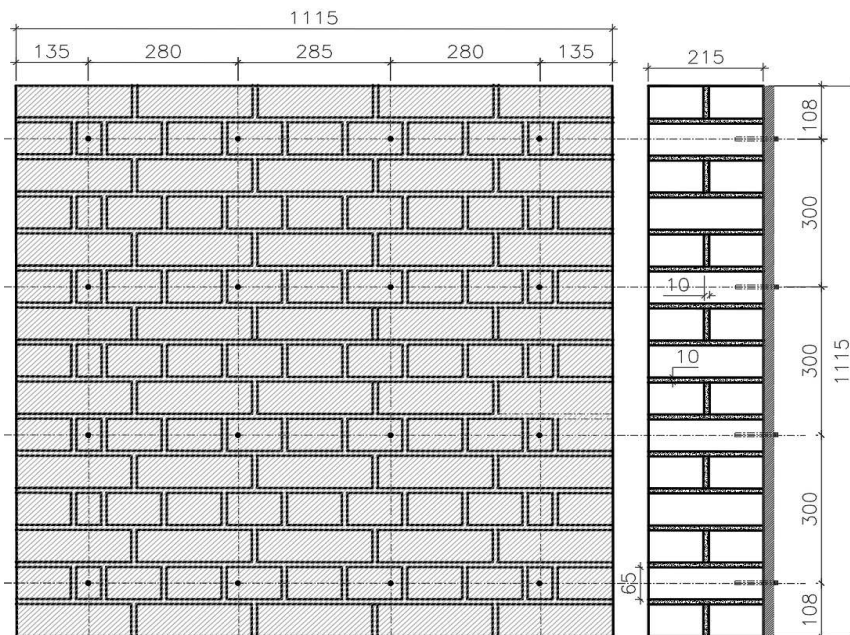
Typical connection layout for retrofitted wall specimens (all dimensions in mm)
